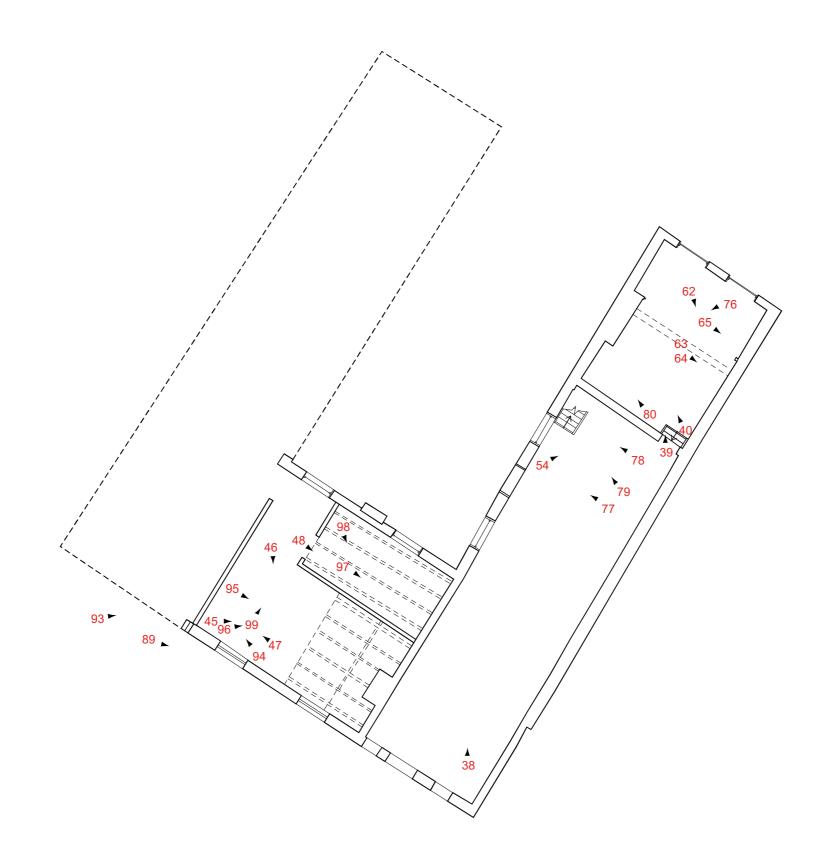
Cellar and ground floor photograph location plan (not to scale)
